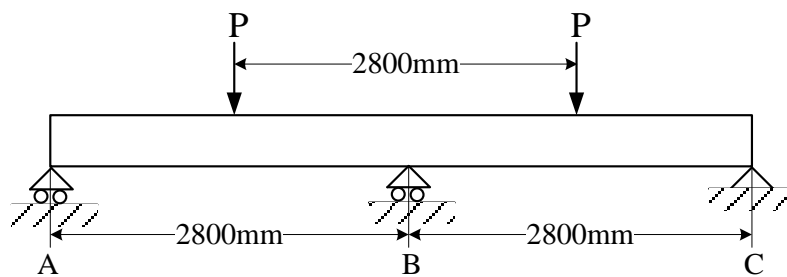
FRP-Reinforced Concrete Continuous Beam Subjected to Loading
